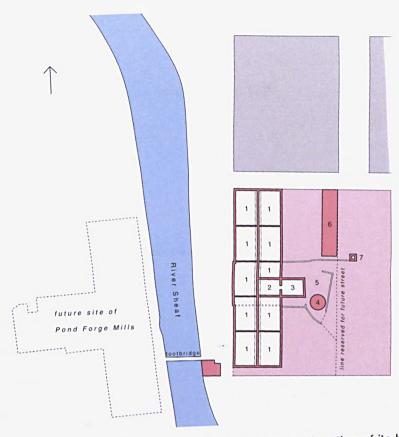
Ground plan of the Park Wheel as first built, with the location of its house-built engine and boiler indicated. Proposed estate blocks in grey. Scale 1:1000 (author).
